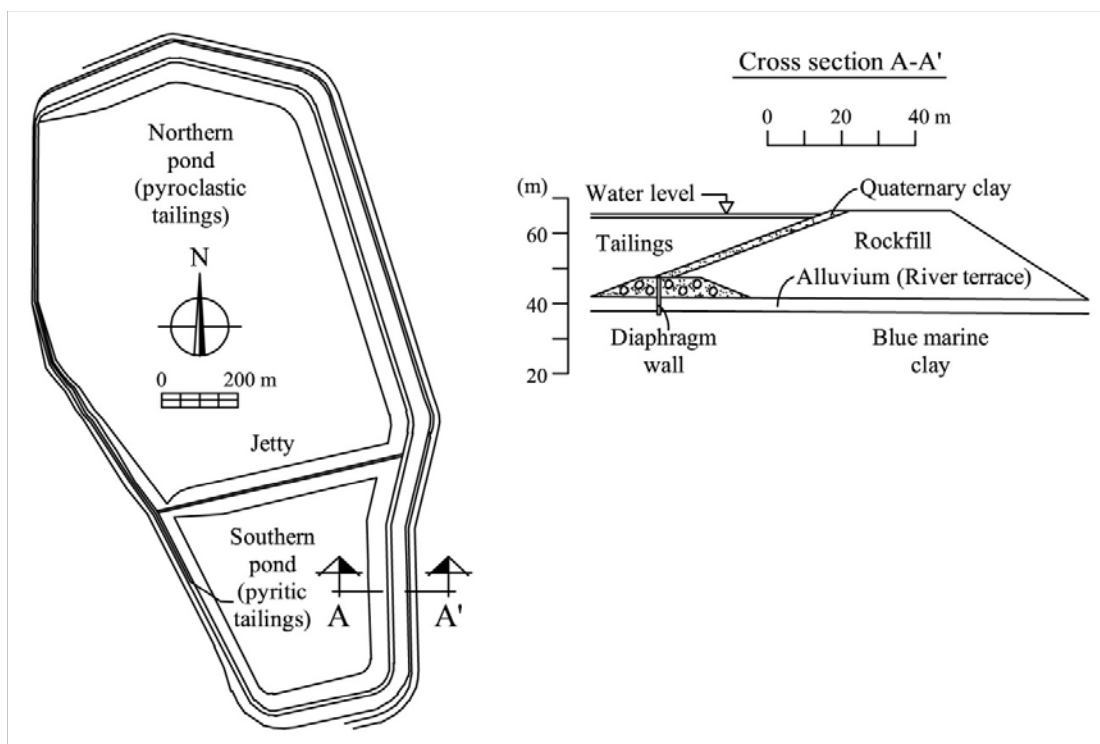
Plan view of the Aznalcóllar tailings deposit and representative cross section of the failed dam
